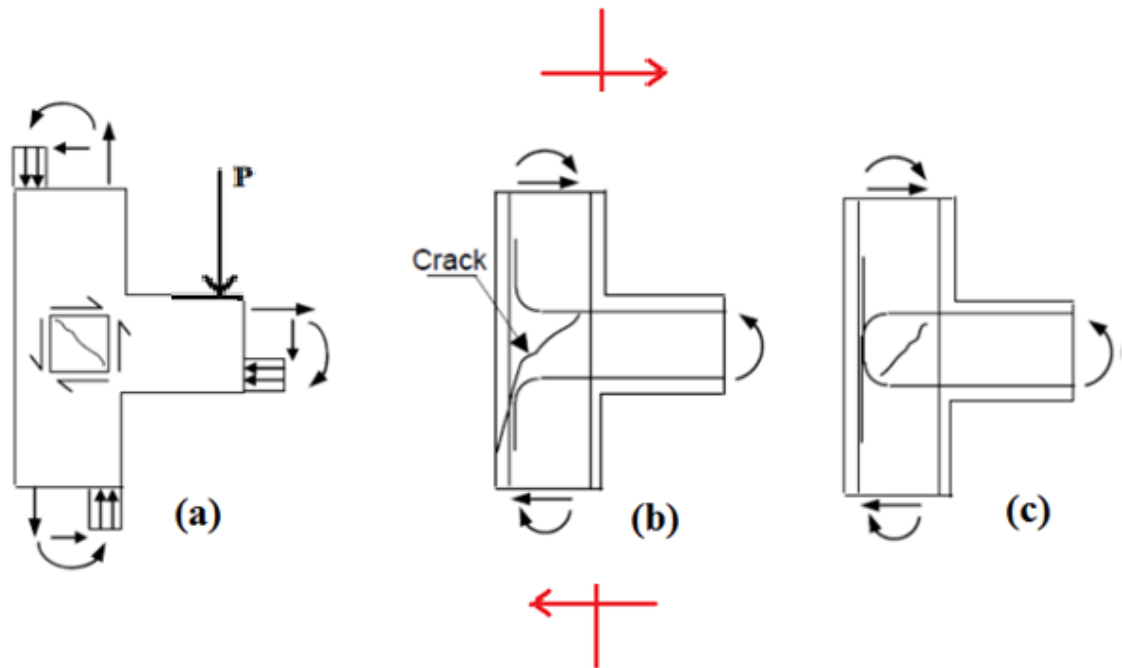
(a) Forces in exterior beam-column joint (b) Exterior joint with Bent up bar (c) Exterior joint with Bent in bar
